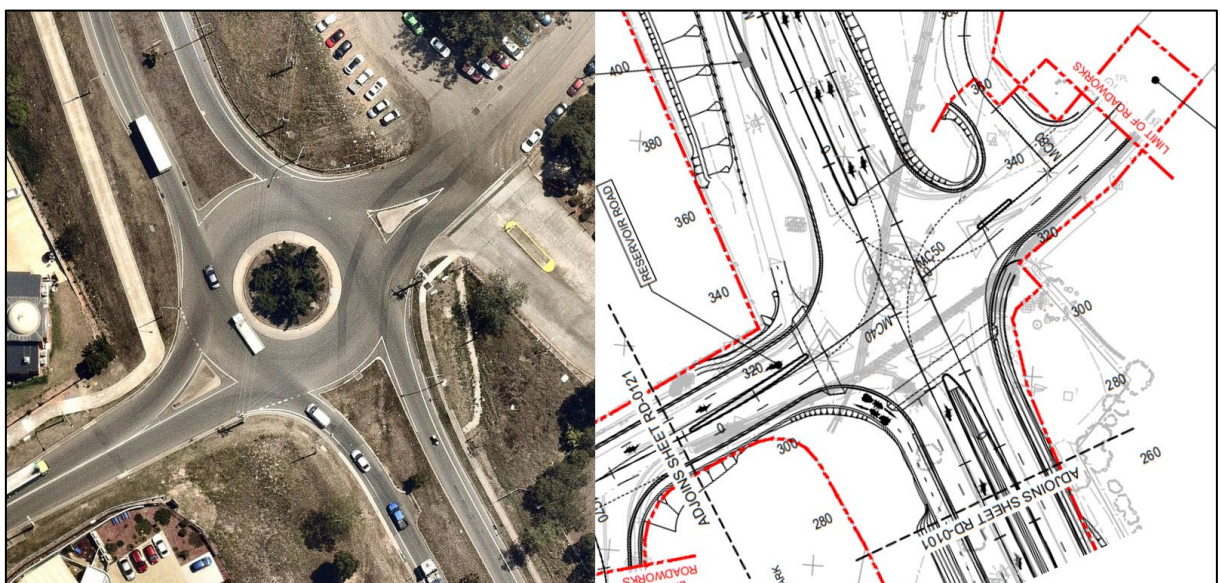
Prospect Highway / Reservoir Road – Existing and SMEC Plans
